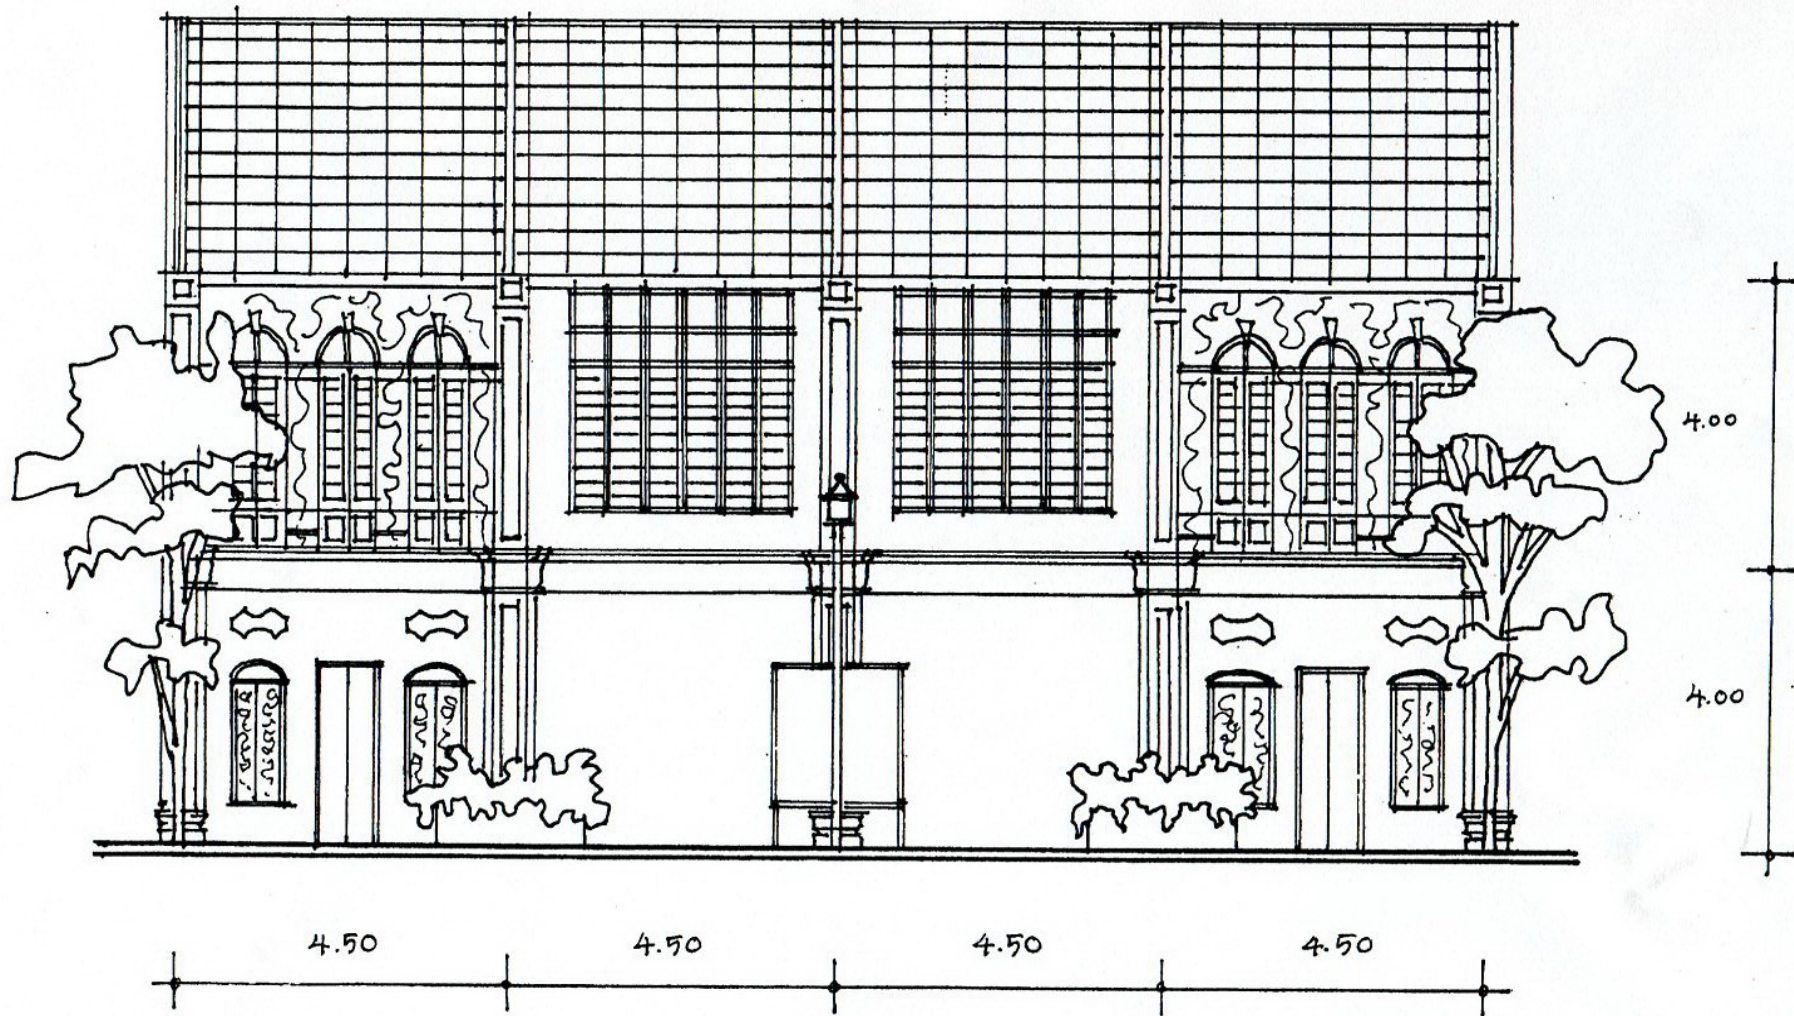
Elevation of streetscape upgrades on Talang Road in Phuket
